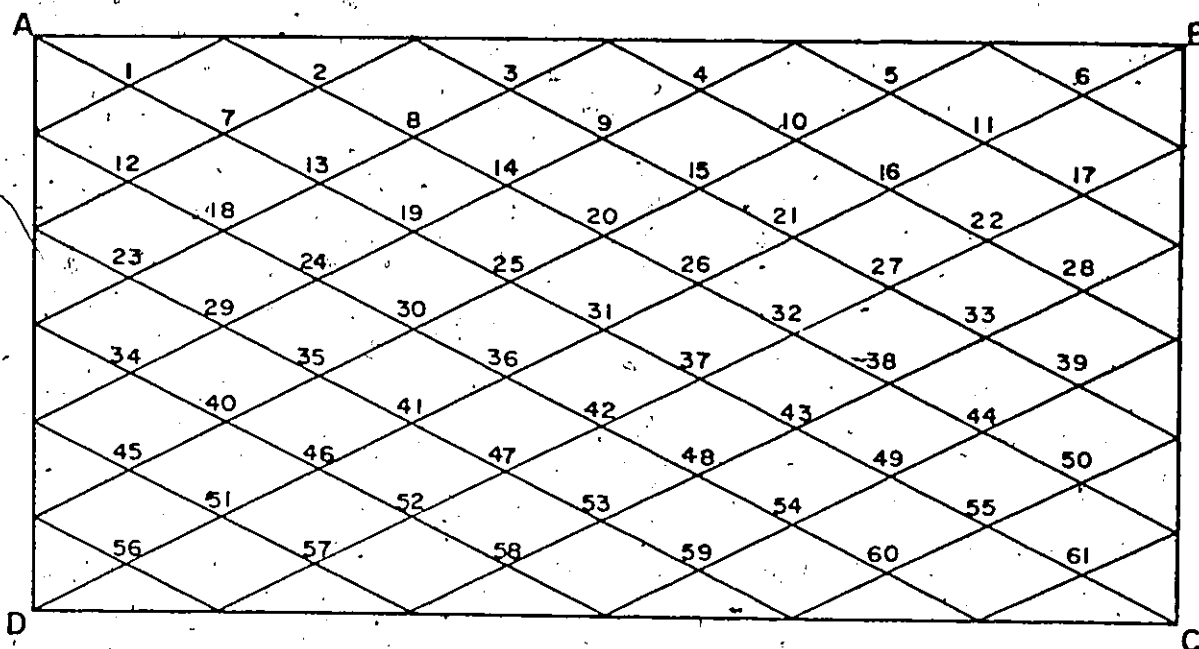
PLAN OF NON ORTHOGONAL SINGLE ROOF
